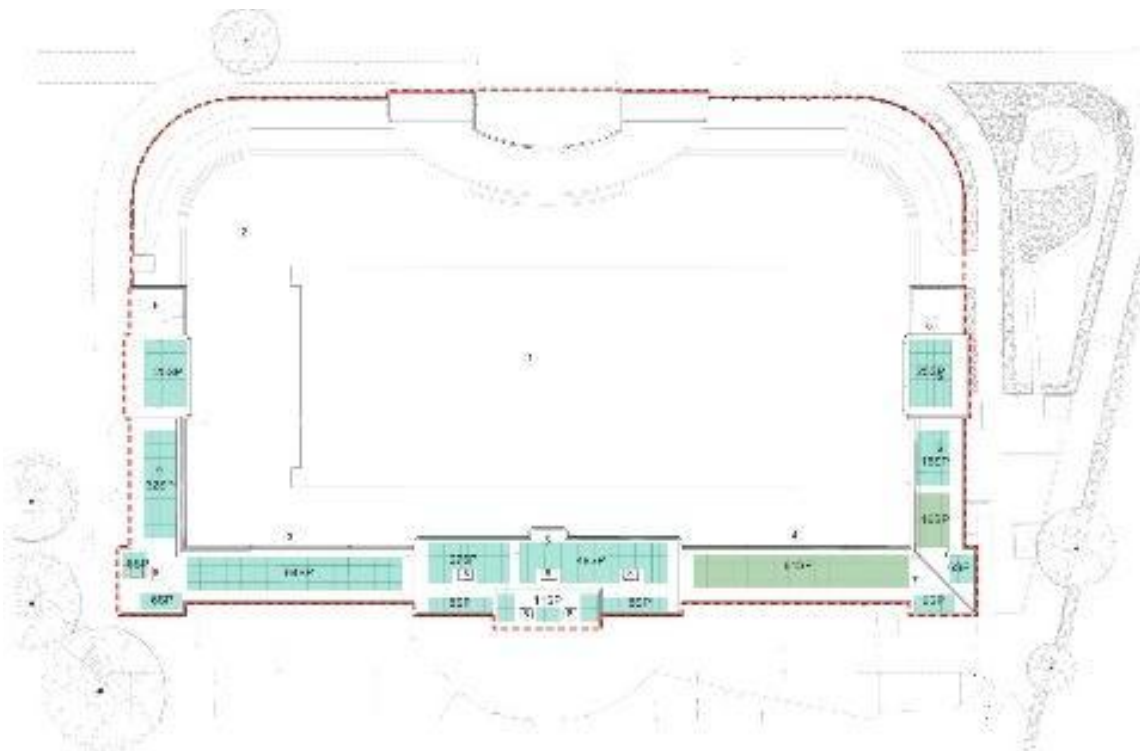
Proposed Roof Plan with existing consented PV panels in light green, proposed in blue. The proposed PV will be symmetrical, not be visible from within the pool enclosure or directly outside it, allow access, improve the '5th elevation' (roof) which is currently a negative contribution as well as enhance clean energy provision. No PV are located on the northernmost roofs of the 'U' shaped building as they would likely be visible from the stepped terraces within the enclosure (see drawing AP_200).
